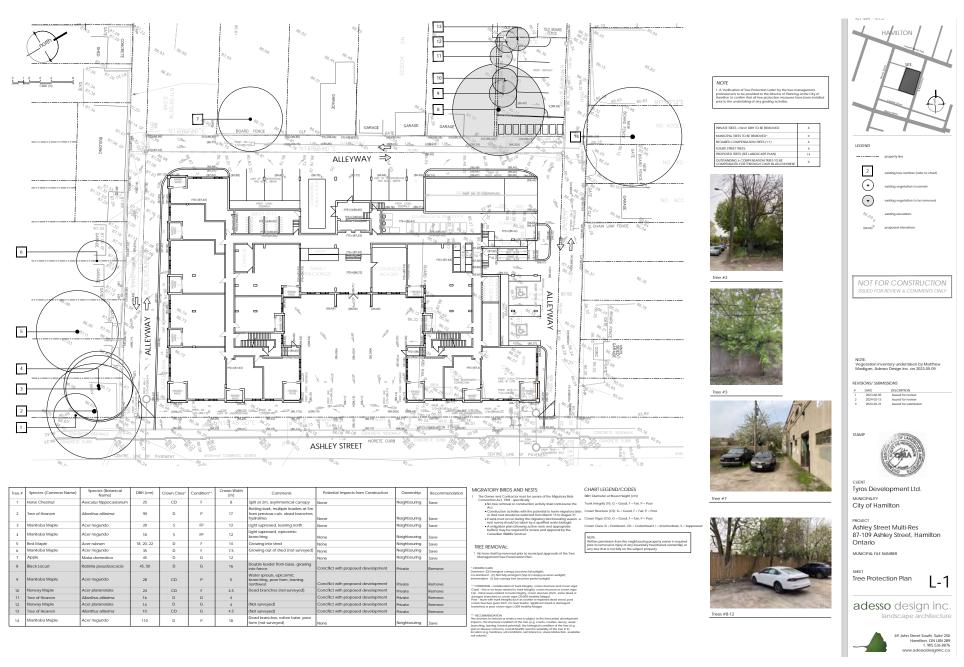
Tree Protection Plan prepared by Adesso Design Inc.
